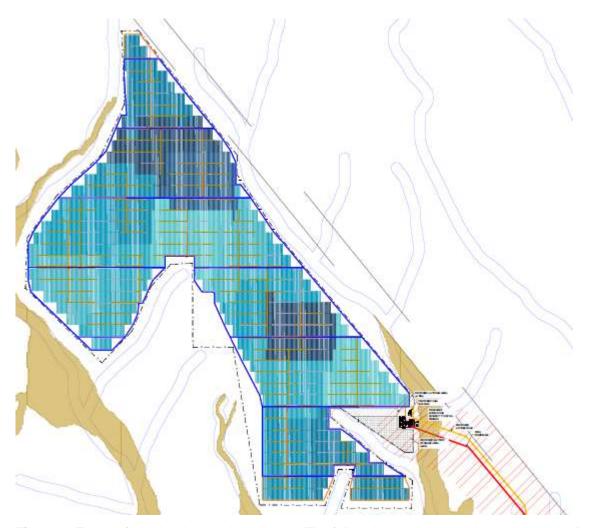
Excerpt from detailed site layout plan. The full scale plans are attached in Appendix D.
